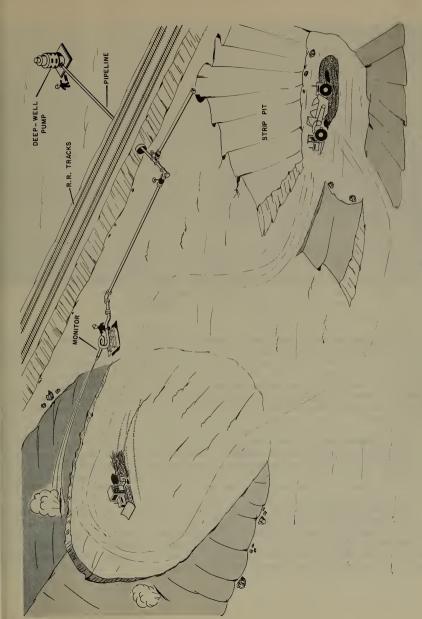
Drawing Illustrating Quenching With Tractor-Scraper Haulage.
